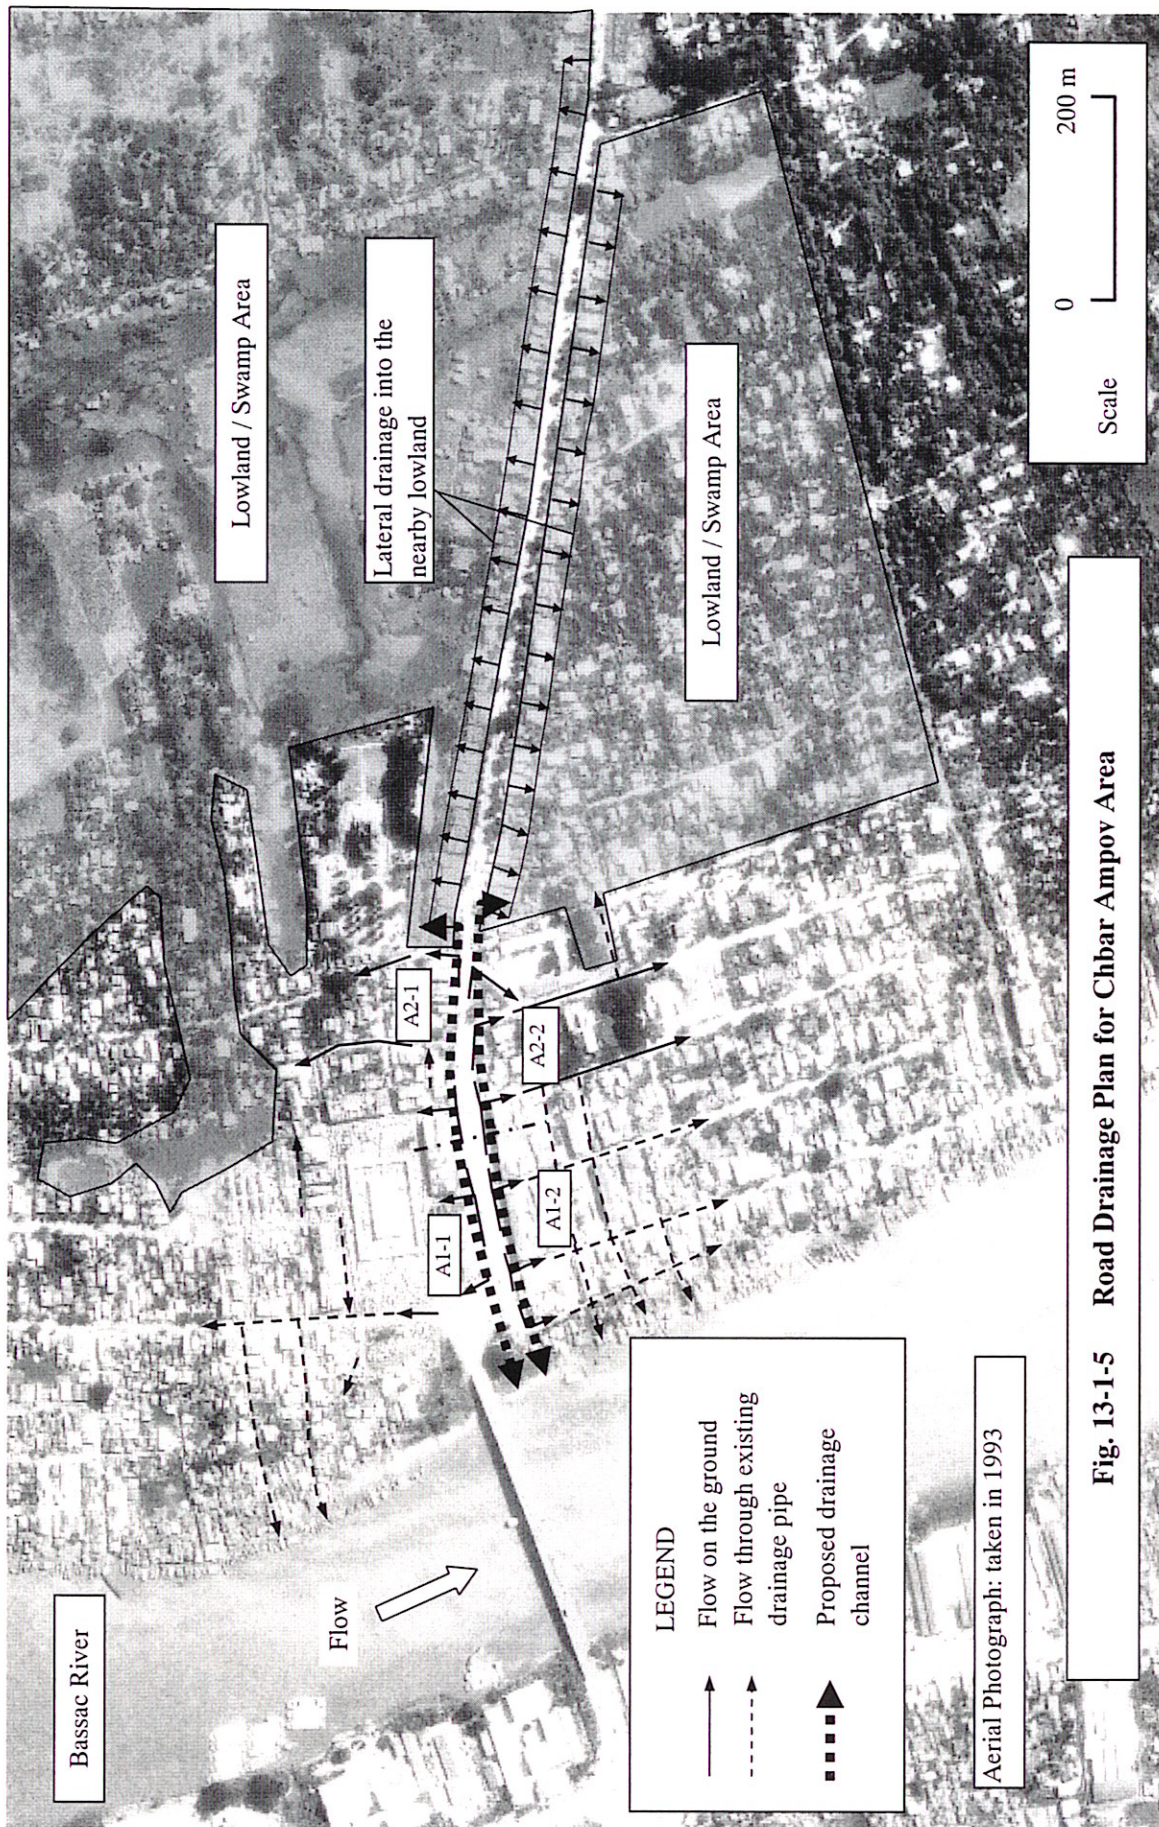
Road Drainage Plan for Chbar Ampov Area
